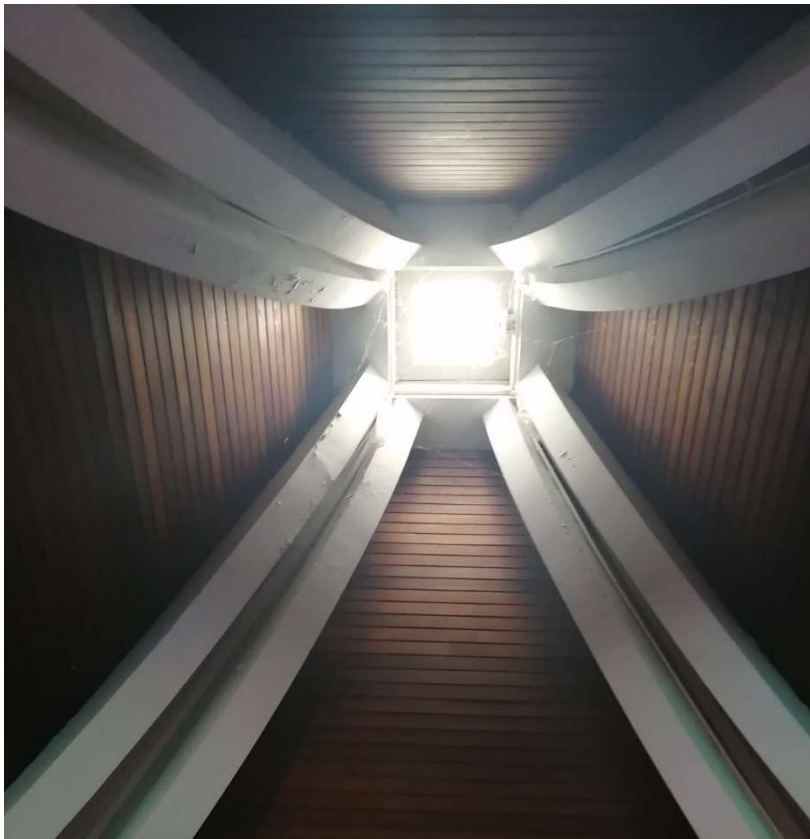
Chapel ceiling featuring wood cladding, exposed curved steel beams, and central skylight (Heritage Planning, 2024).
